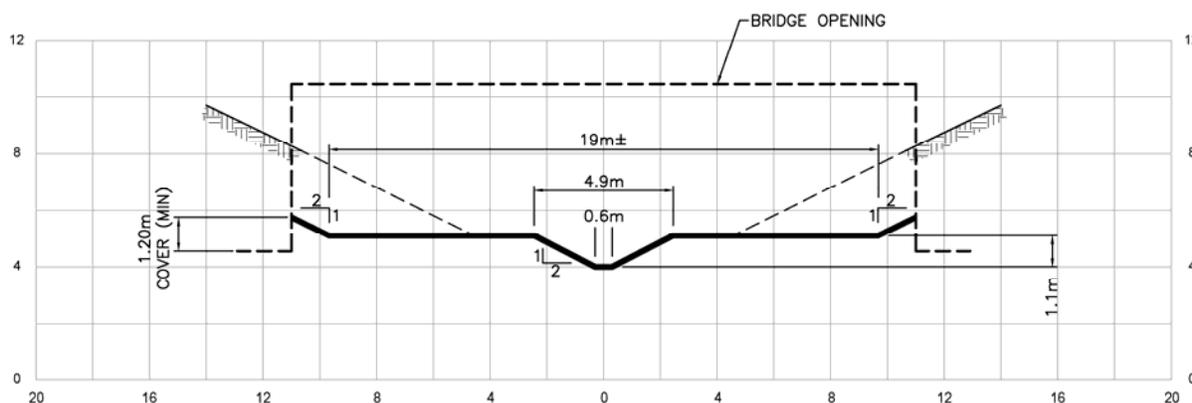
Alternative A6: Widen By-pass Channel – Cross section under bridge (typical)
